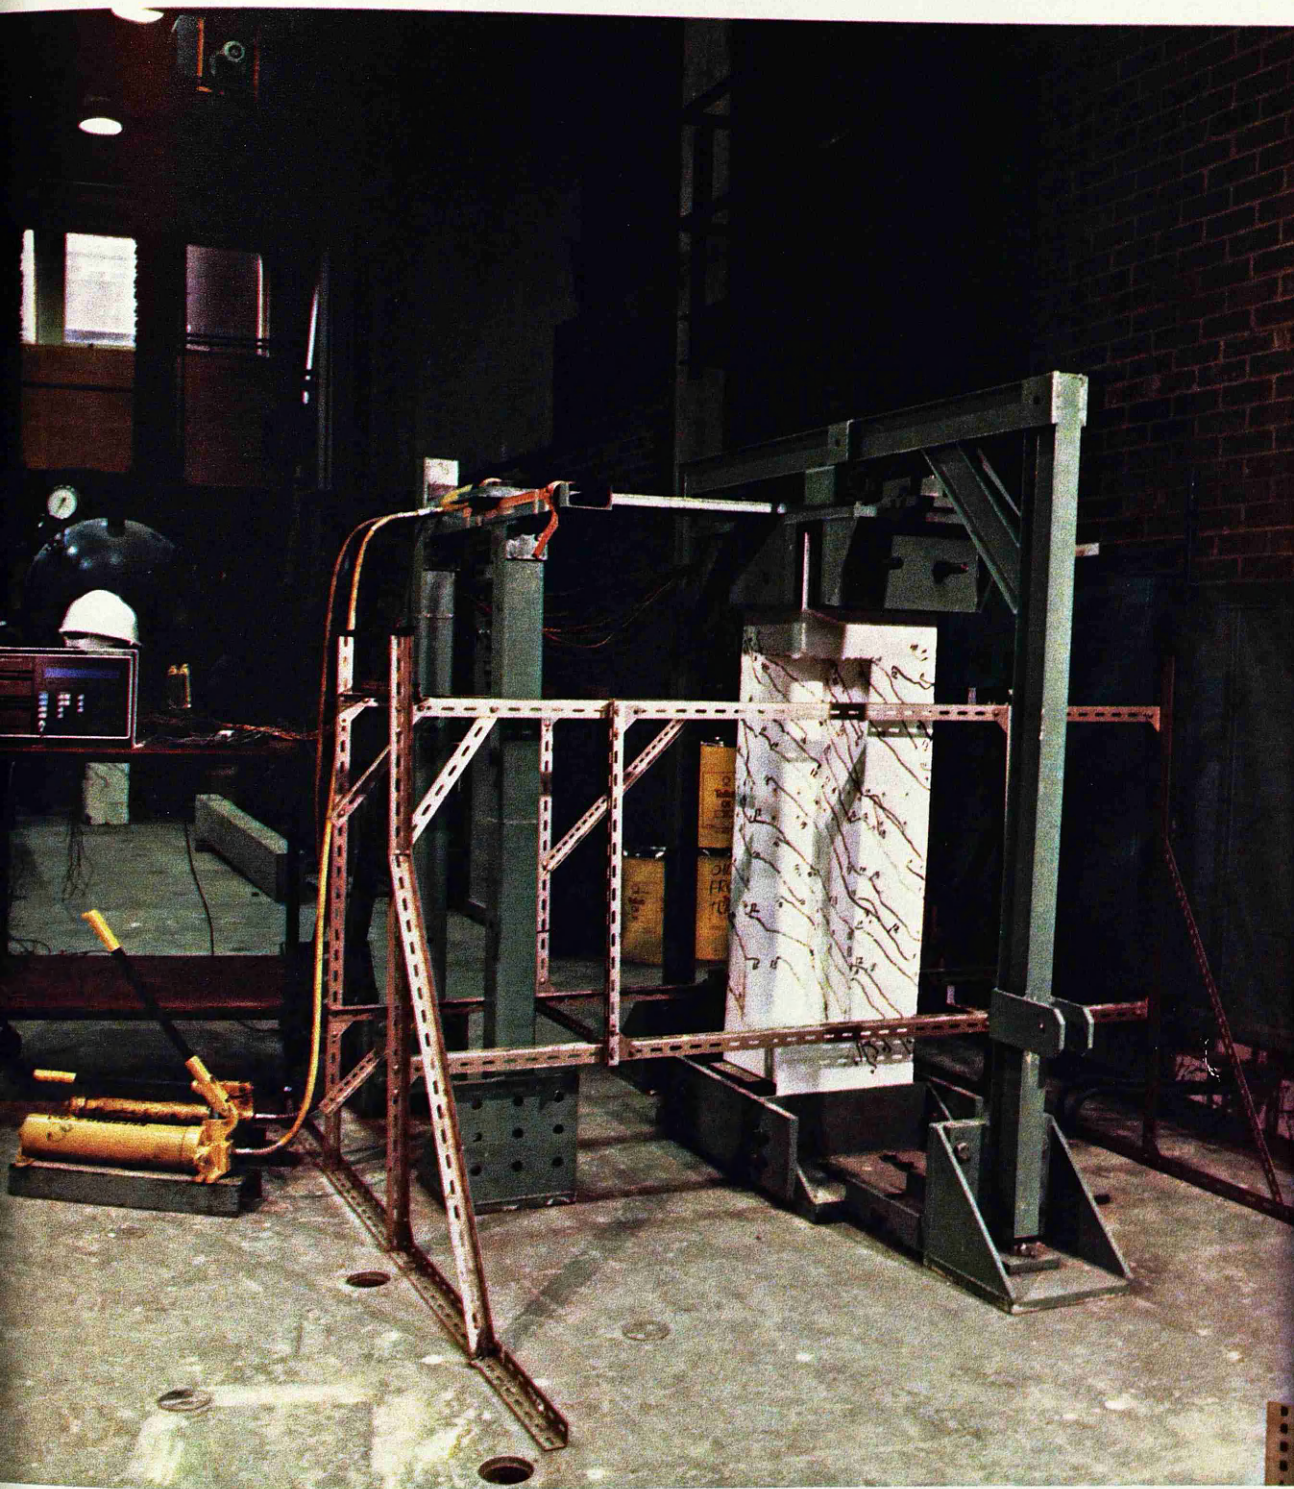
Photograph of test-rig with specimen (B14) after test
